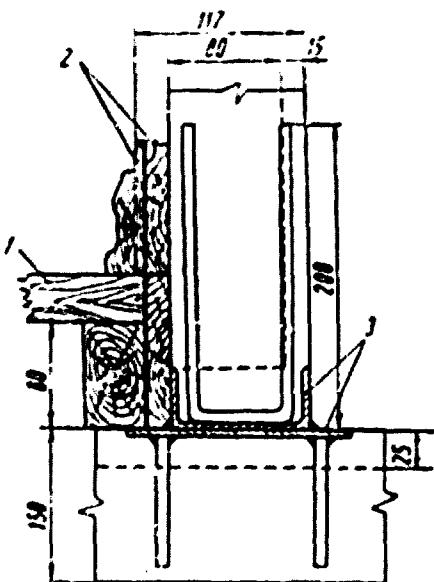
Connecting the Walls of the Superstructure with the Deck. 1-decking of the superstructure floor; 2-sheathing of the area (of board, tolite-skin, plywood); 3-the inserted parts with the anchors.
